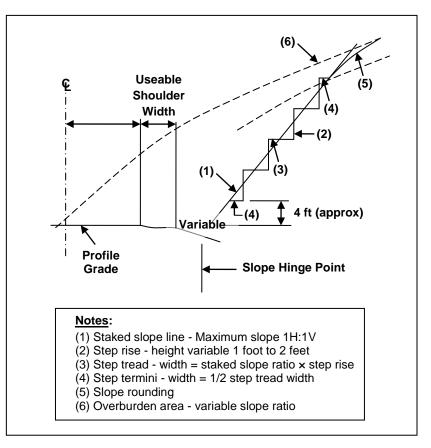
Typical Configuration of a Benched Slope (Soil)
